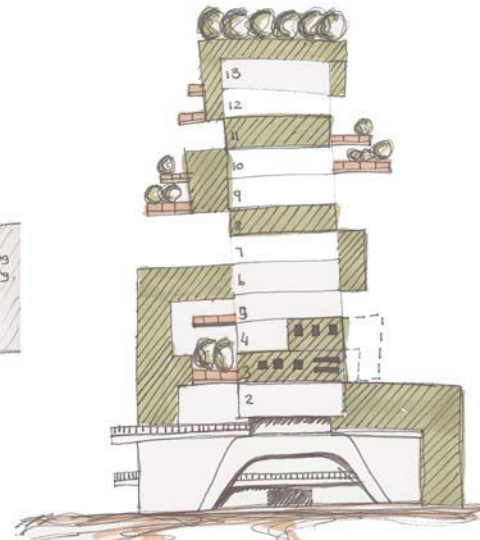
West elevation illustrating “clip-on” units and balconies
